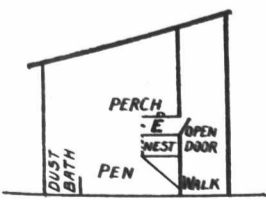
FIG. II.—END VIEW CROSS-SECTION OF POULTRY HOUSE.
